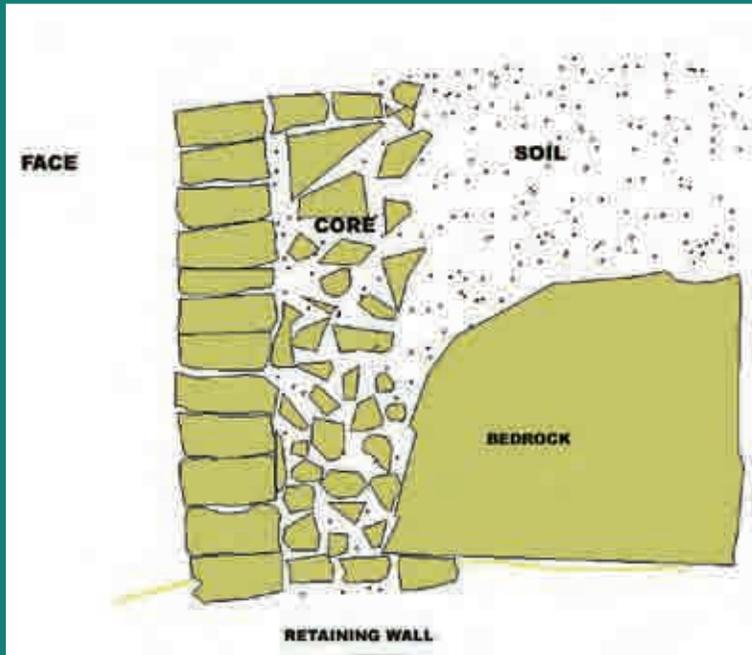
Illustrated dry-stone walling used for platform construction
